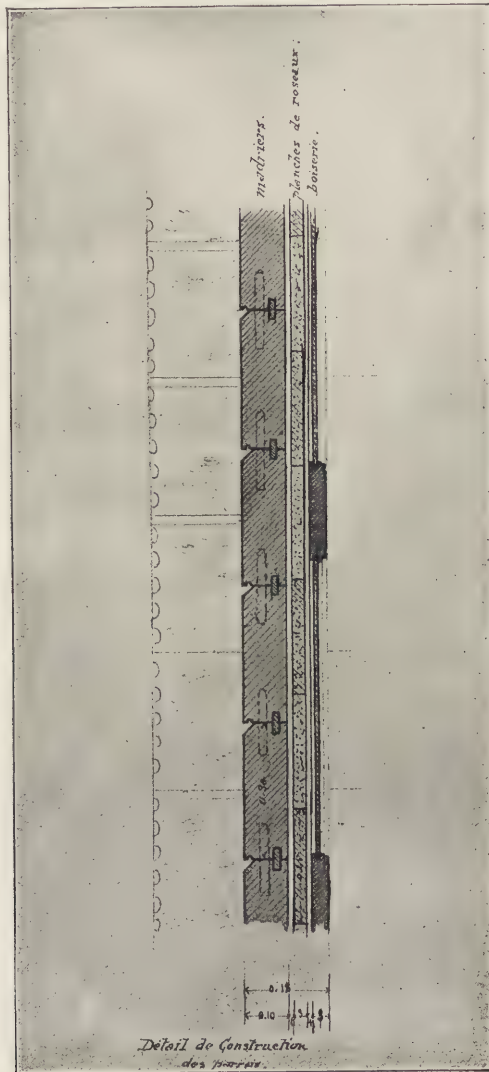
SECTION OF WALL OF A MODERN CHALET.
